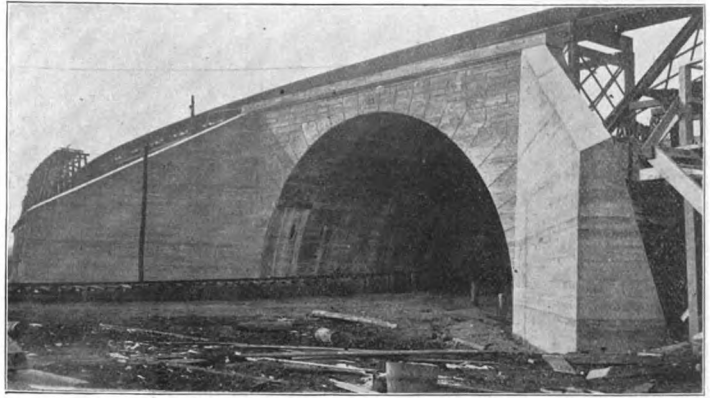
60 FT. CONCRETE ARCH BRIDGE AT CAIRO, STRUCTURE COMPLETED.
